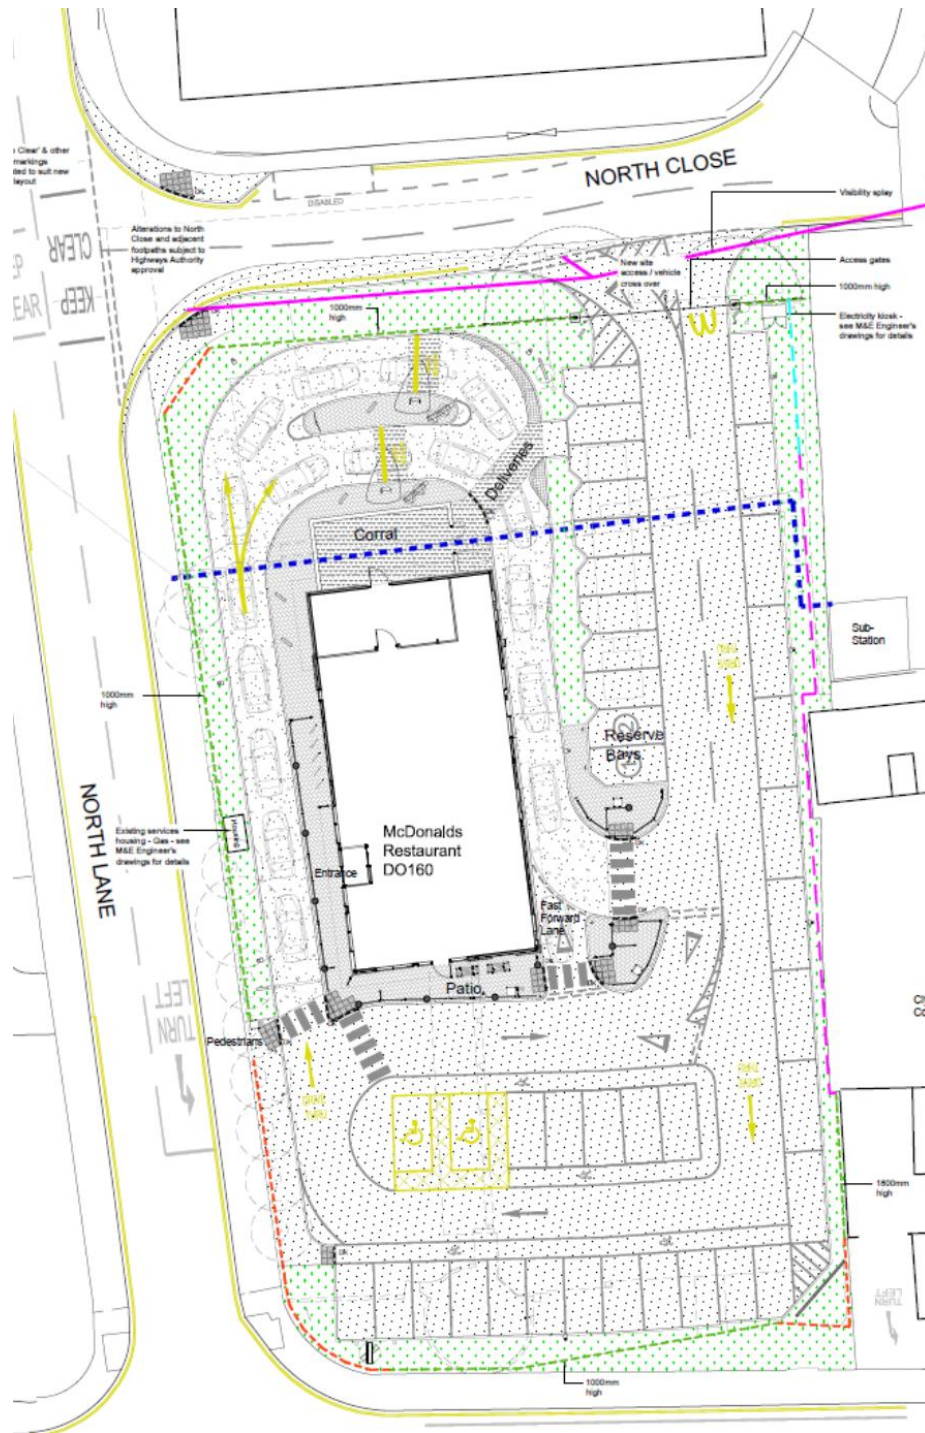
Approved Site Layout Plan 304 C: Note that the mini-roundabout at the junction of North Lane with North Close and Lower Newport Road is not shown on this plan since, at that time, the design was subject to approval by the Highway Authority (Hampshire County Council).
